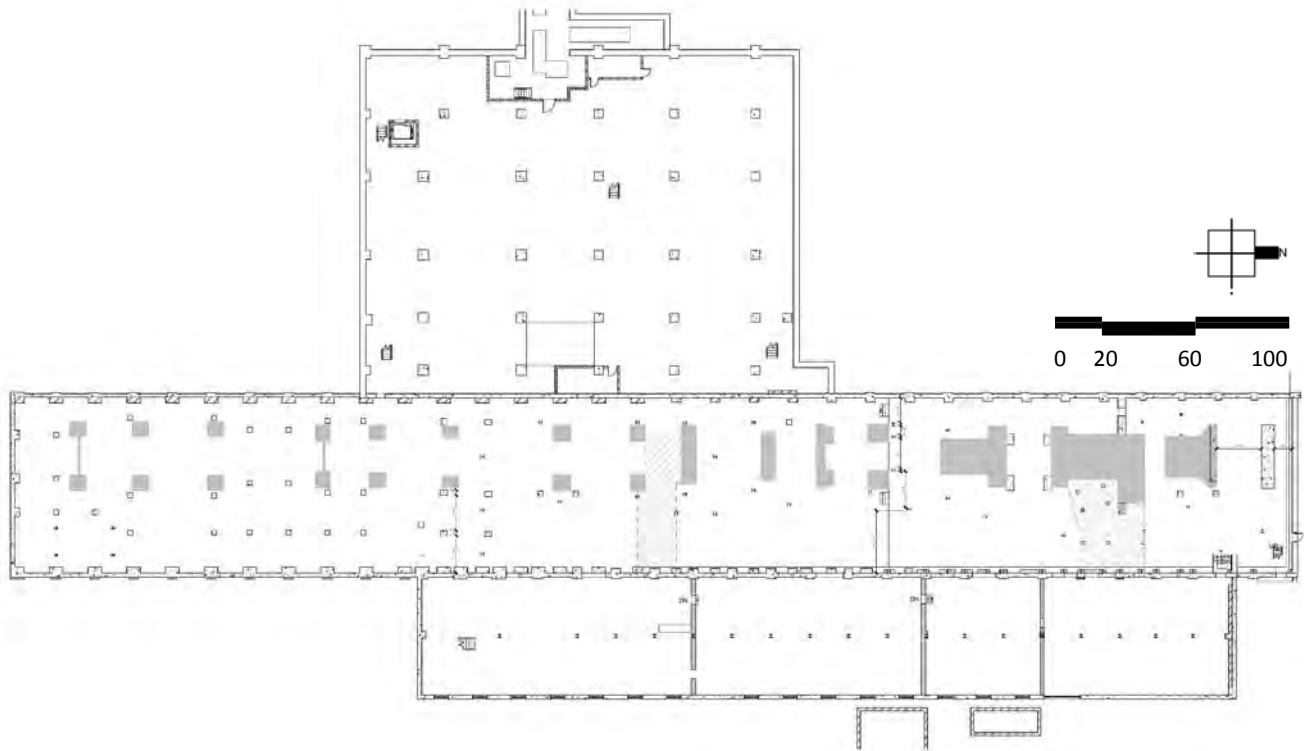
Basement Floor Plan. Alley Poyner Macchietto Architecture, 2014.
